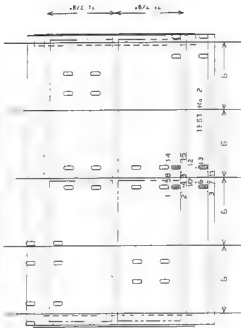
LVDT Locations (Third Bridge - Test No 2)
